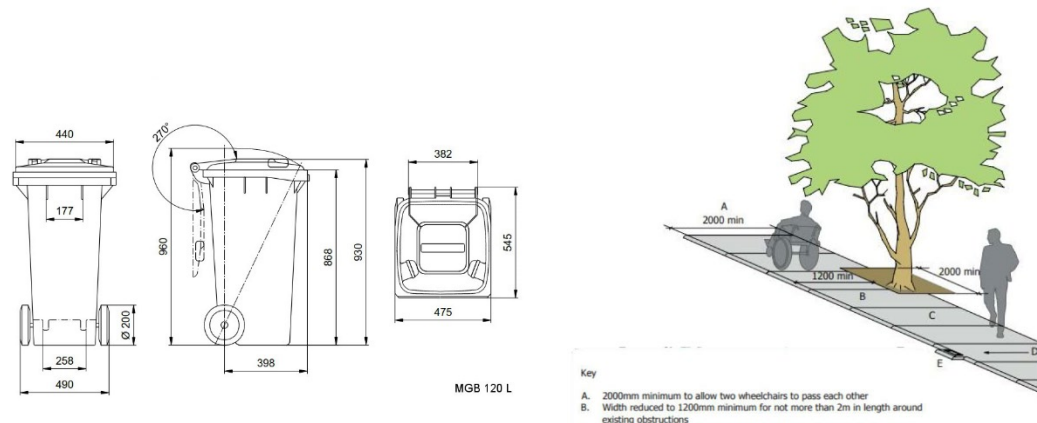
Typical dimensions of bins and accessibility recommendations from Building for Everyone: A Universal Design Approach
